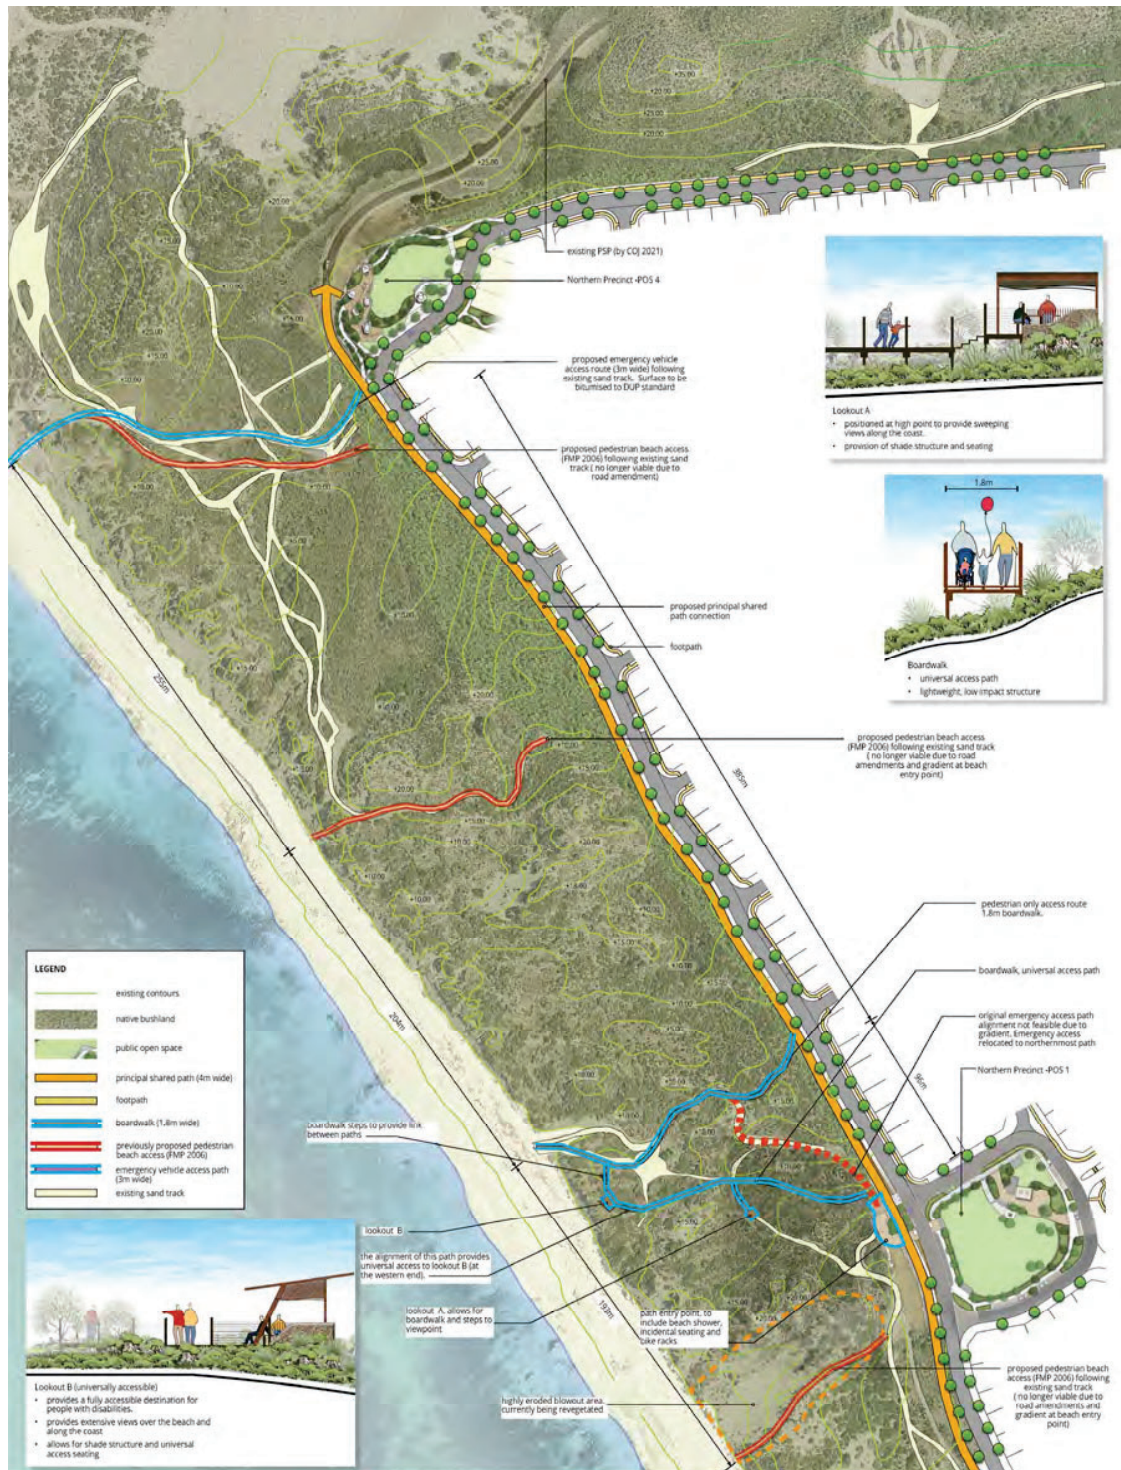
Foreshore Access Plan 2022– Updated Plan showing indicative landscape elements
